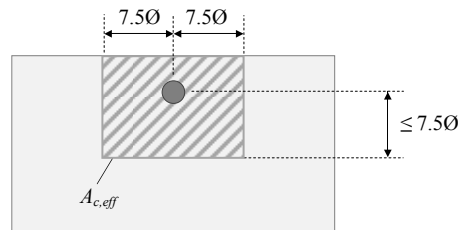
Effective area of concrete in tension, $A_{c,eff}$, stiffened by the reinforcement steel bar [10]
